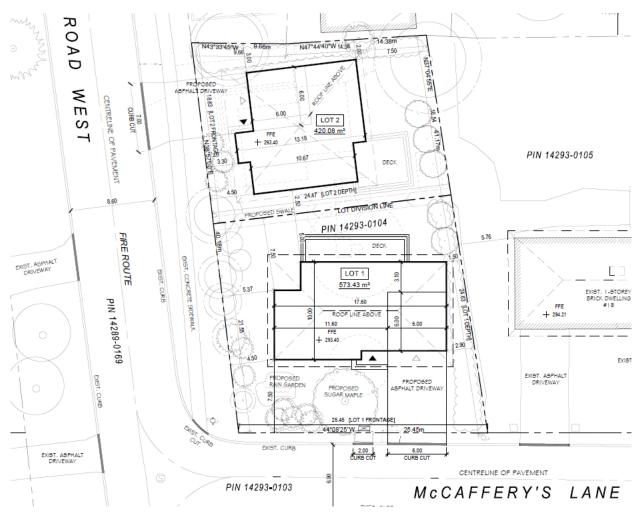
Proposed Development of 4 Walker Road West, Caledon
